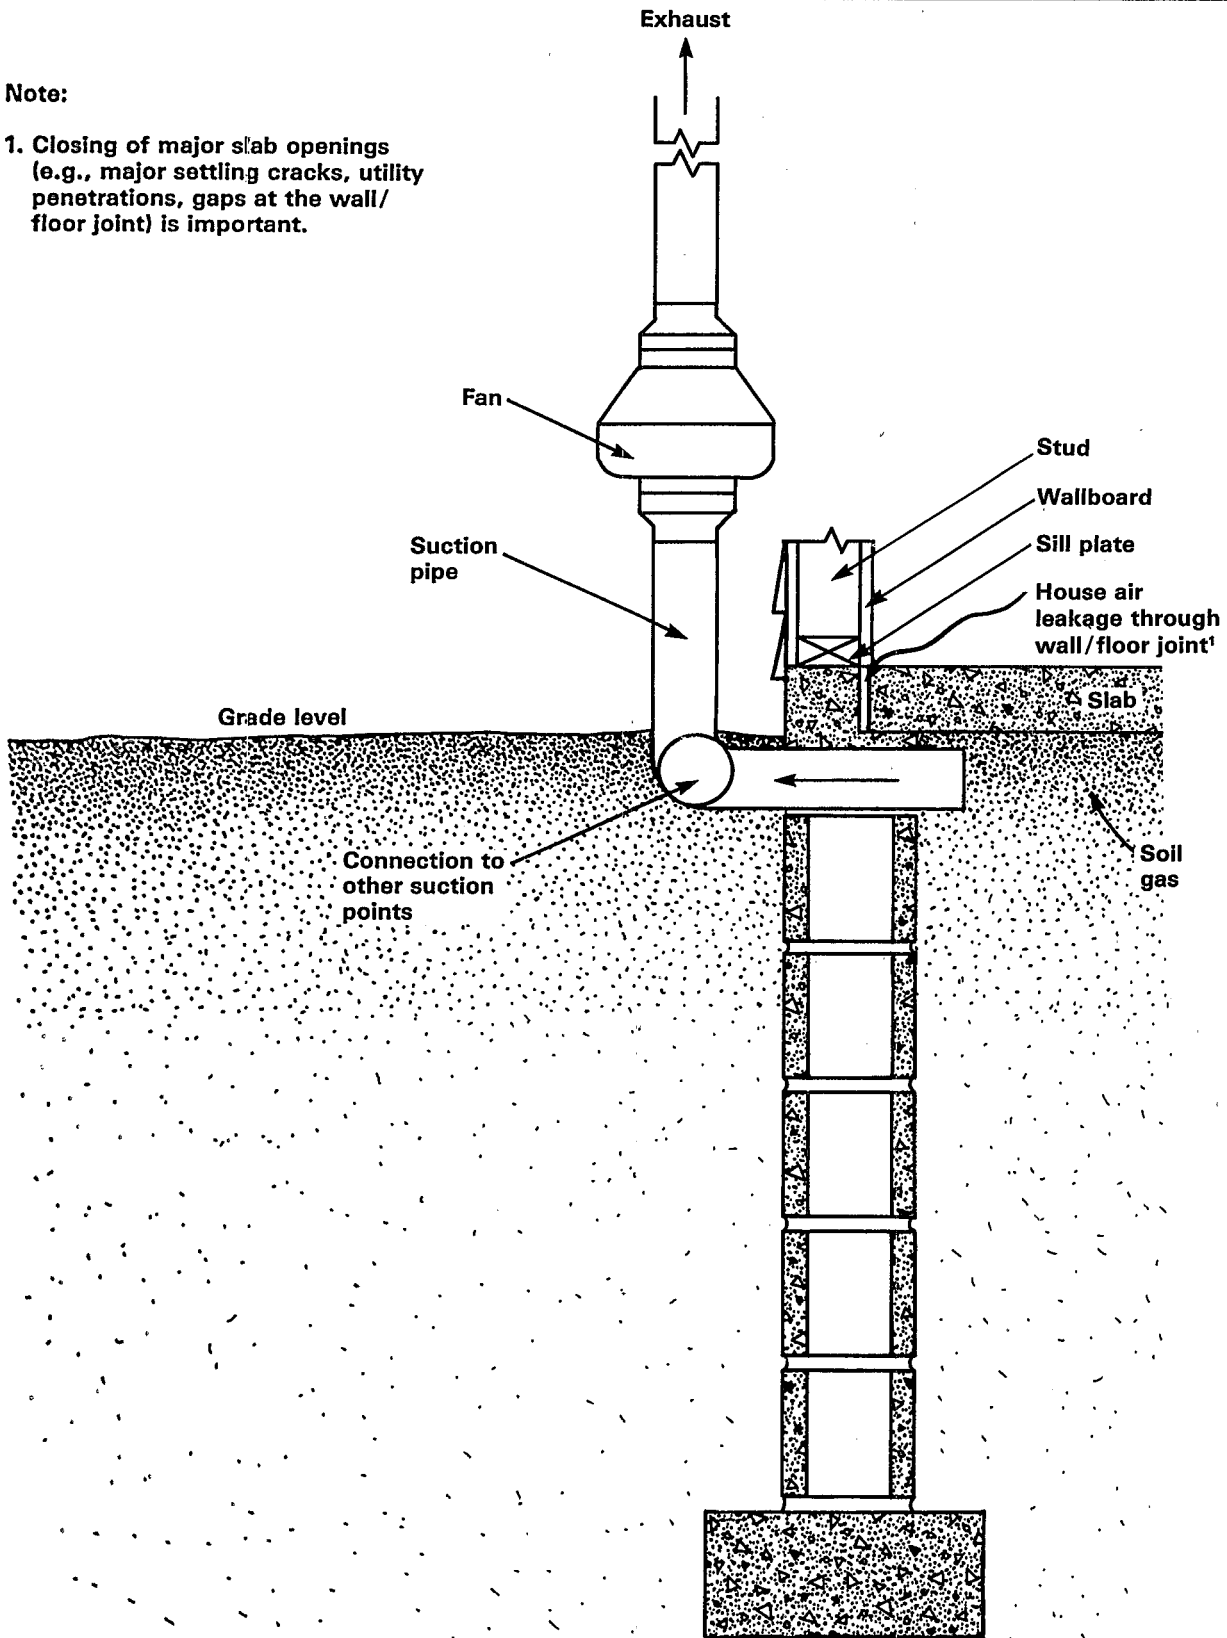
Sub-slab suction using pipes inserted through foundation wall from outside.
